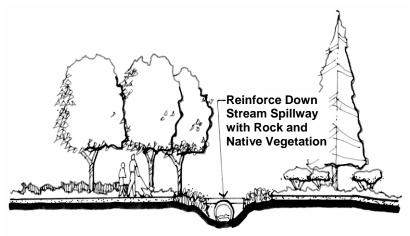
Low Water Crossing of Minor Stream or Drainage N.T.S. Section View
